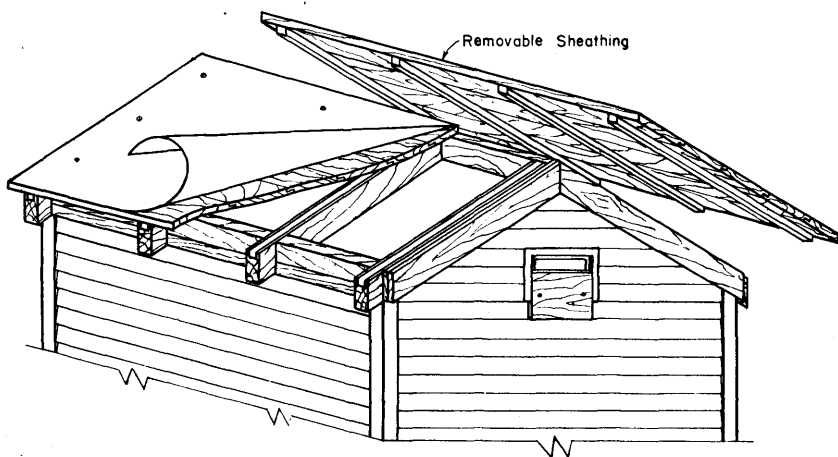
CONSTRUCTION DETAILS OF ATTIC FOR ATTIC VENTILATION TESTS
